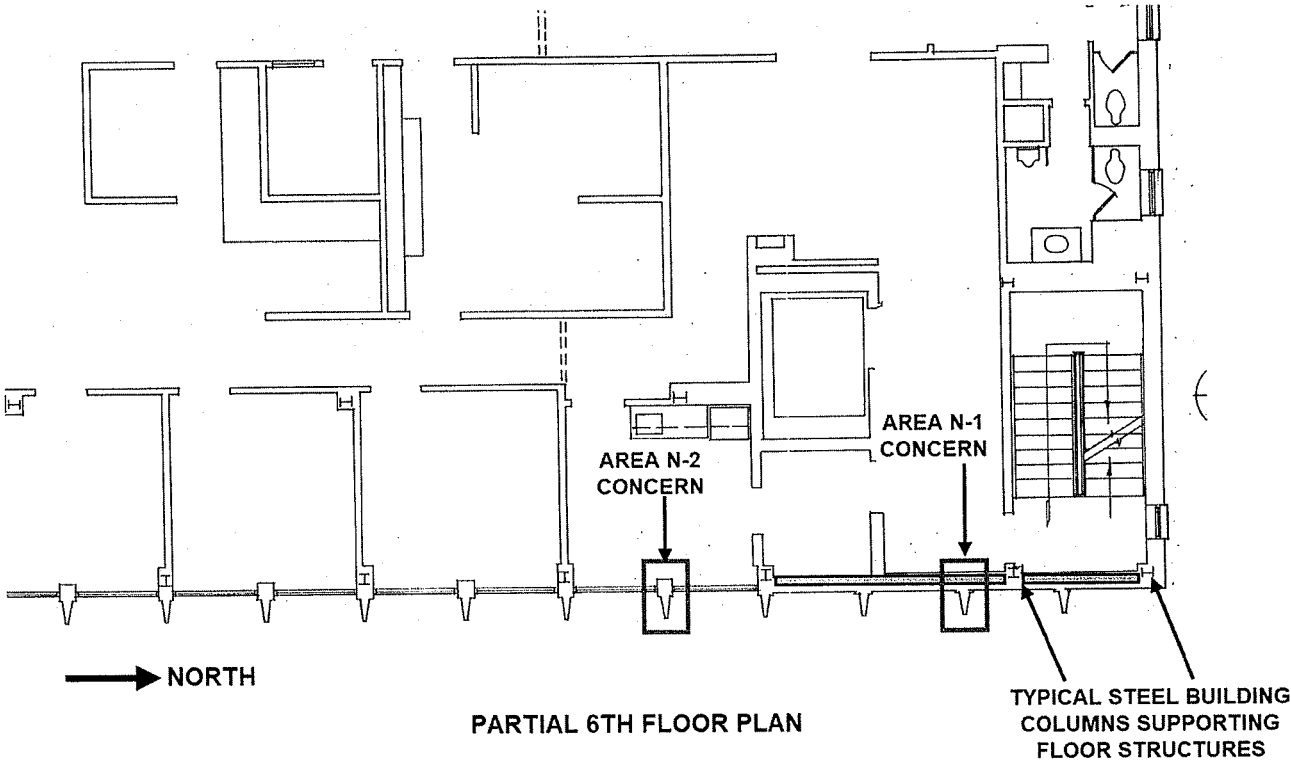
Floor Plan Showing Wall Areas That Have Lost Substantial Lateral Support
